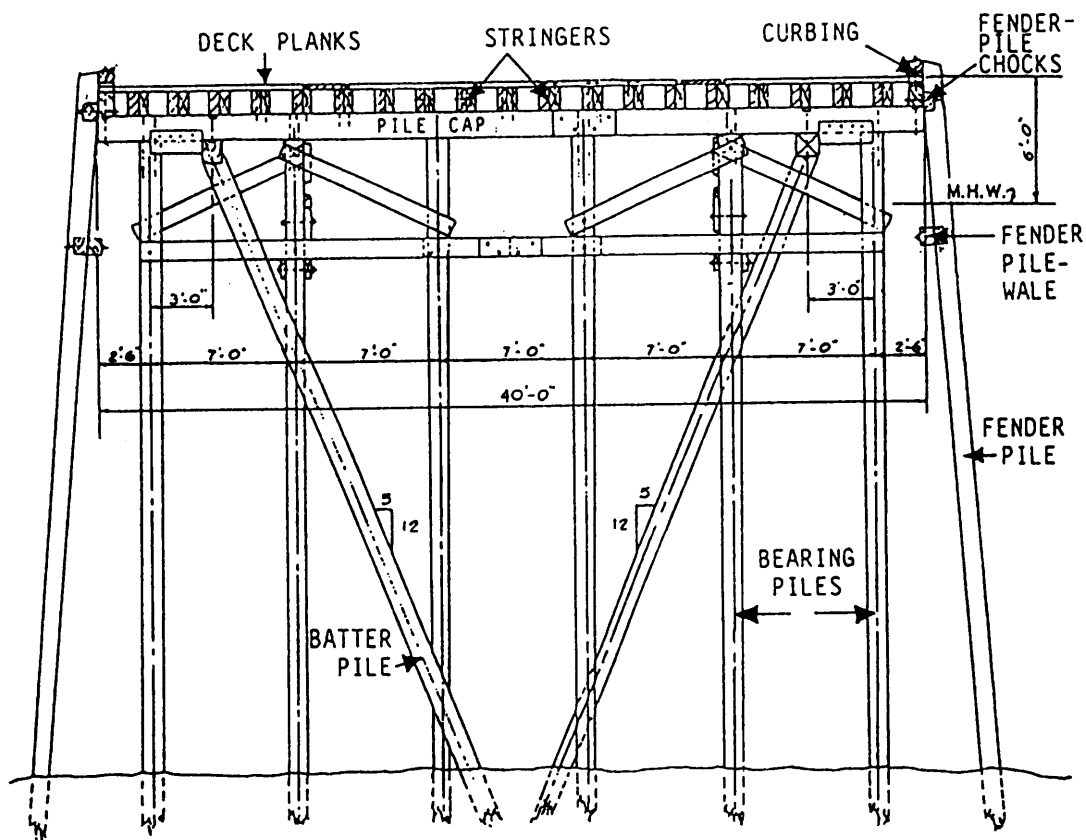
General plan of an advanced-base 40-foot timber pier.
